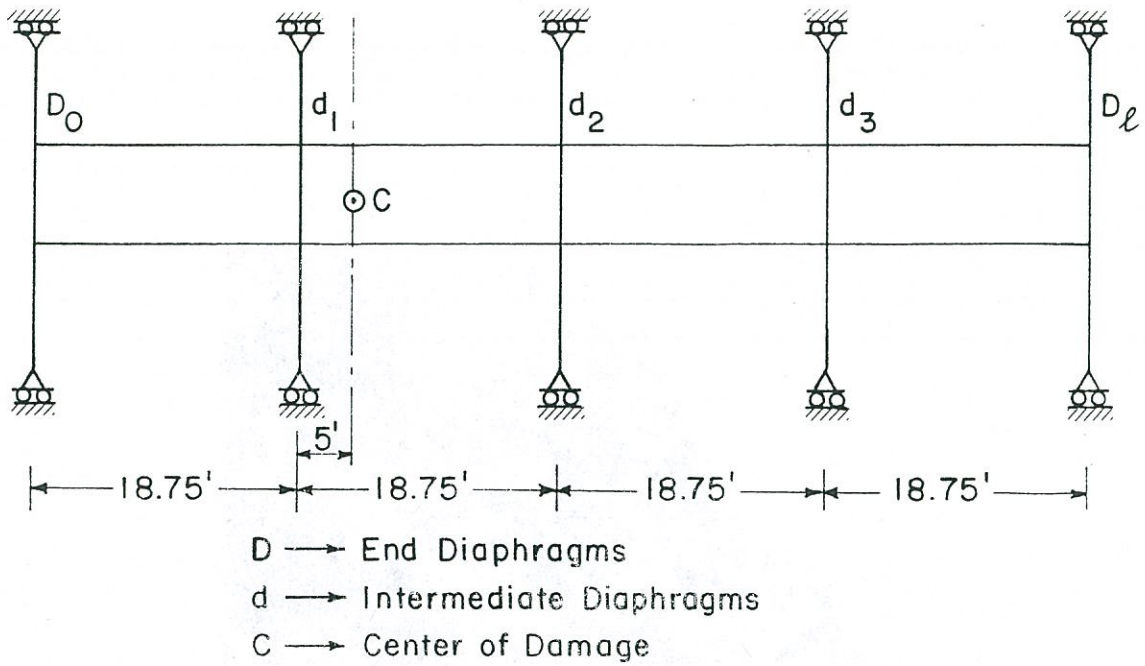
Layout of the damage W33x241 composite girder on Crowley bridge showing the location of the center of damage and vee heats.
